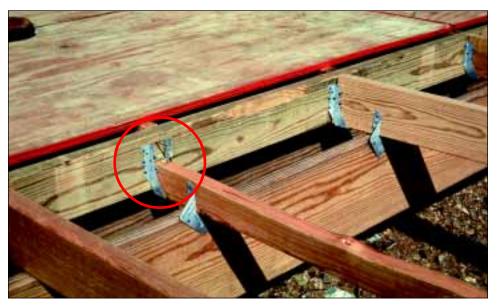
Example of the failure of wood member in the floor joist hanger due to the use of improper nails. The hurricane clip was used to secure the floor joist to the support beam. This house was located on the island of Culebra.
